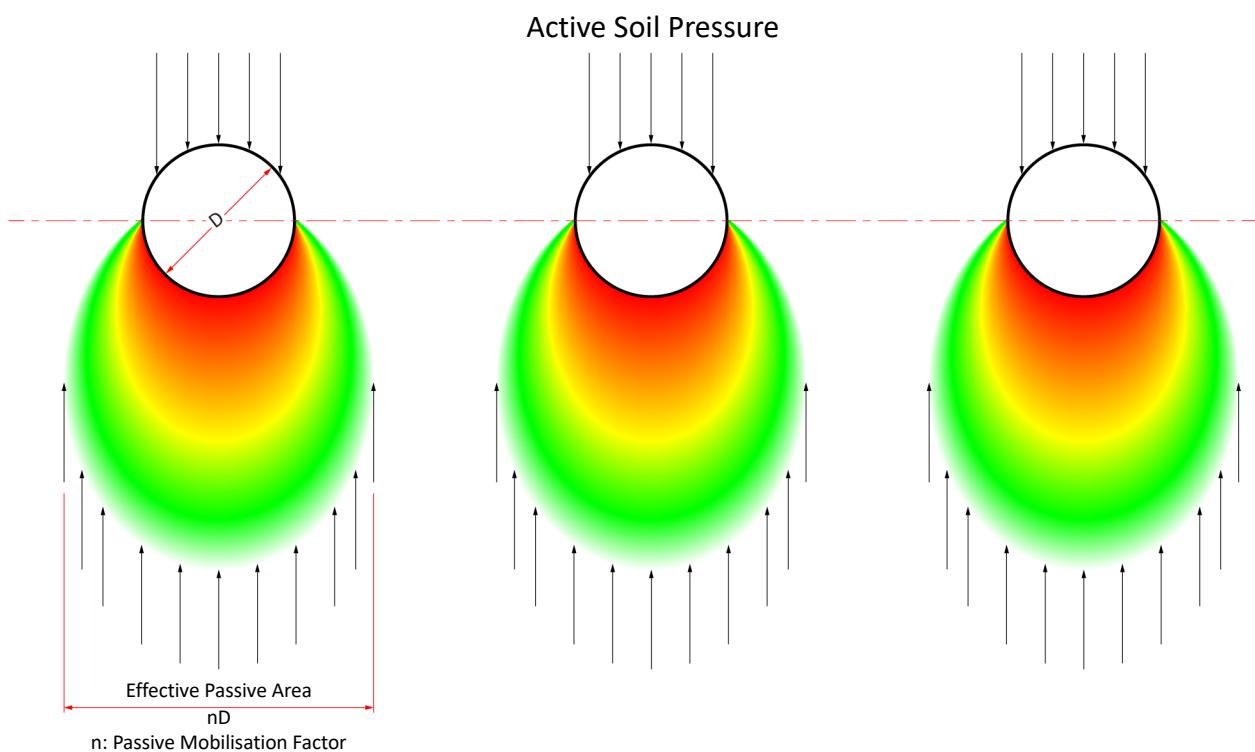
(d). Earth pressure diagram - Plan in section C-C (Pattern A, below SSP toe level)
